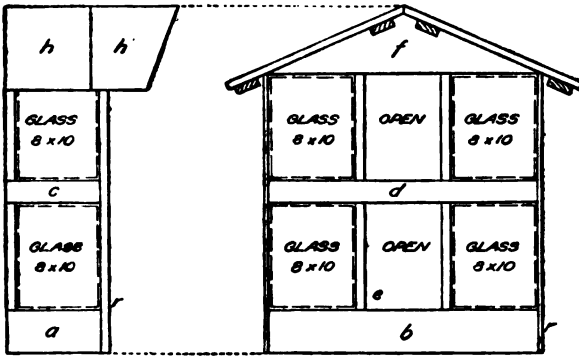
Front and side elevations of shelter shown in figure 42.
